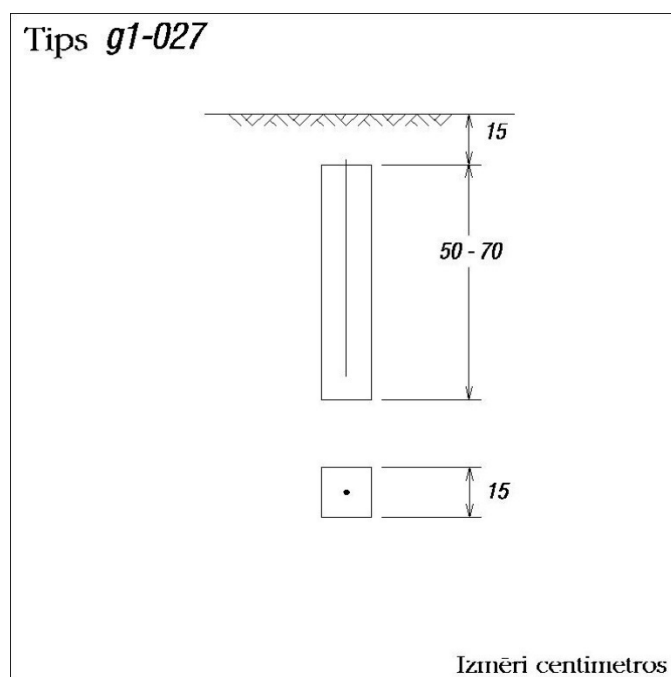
Benchmark Type g1-027, which must be removed before installing LV-CP0H-40
